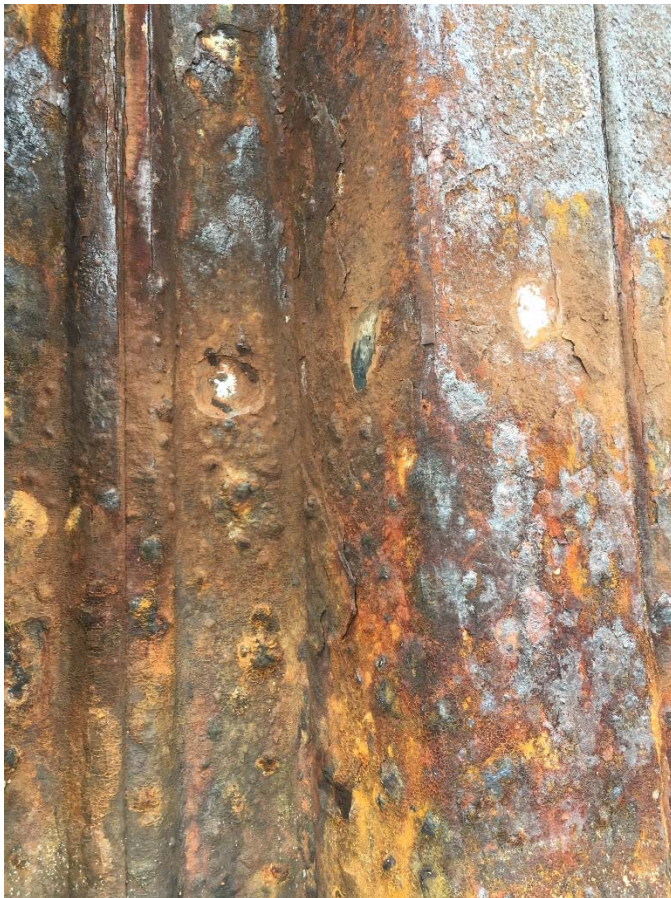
General condition of sheet piling in 2013, northwest side of facility.
